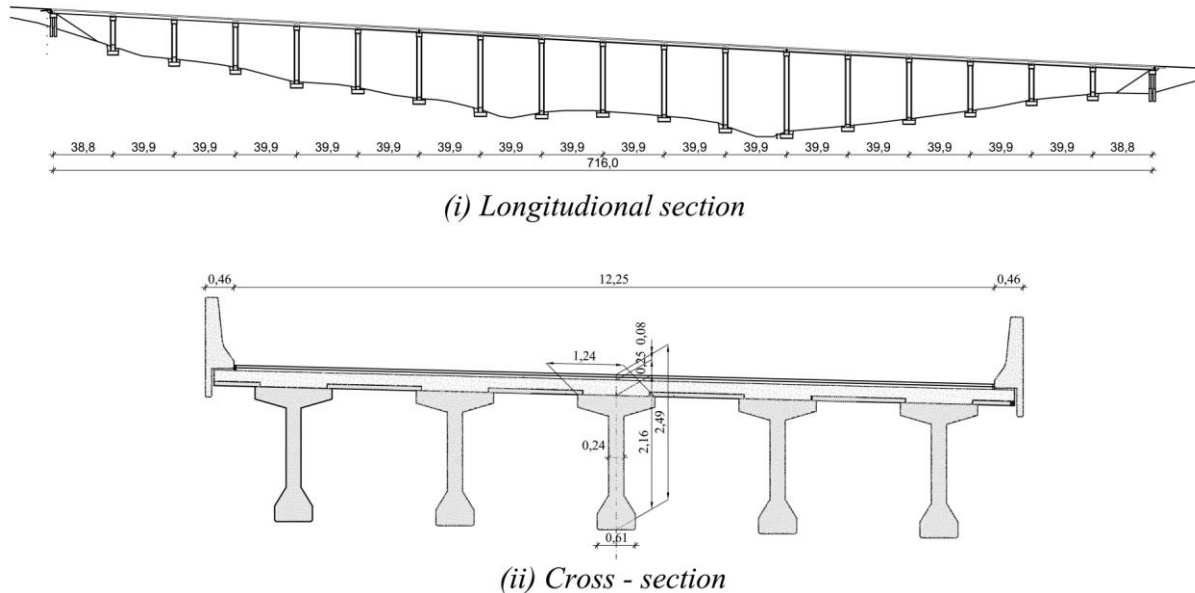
Longitudinal and cross – section of the Severinske Drage Viaduct
